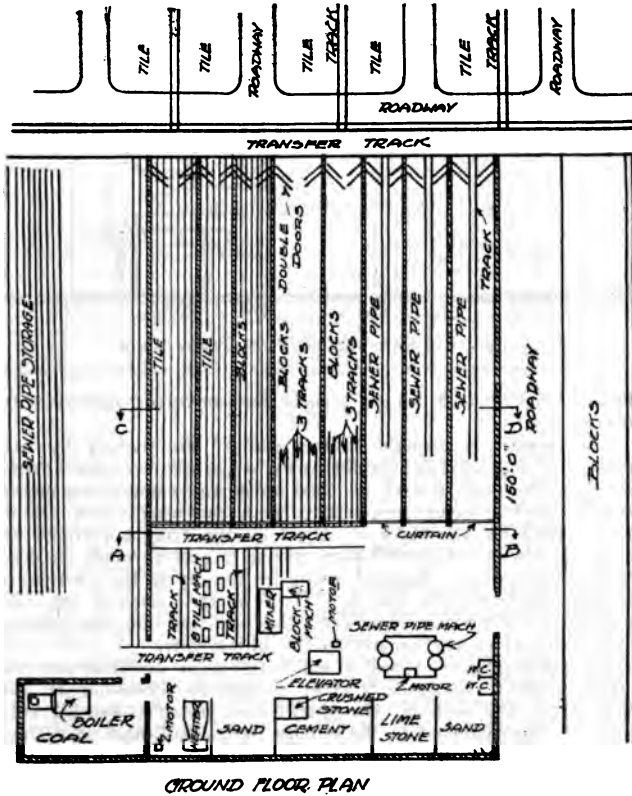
FIRST FLOOR PLAN, PLANT NO. 4
